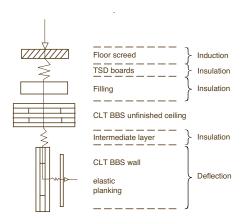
Reduction of structure-borne sound Source: HFA planning brochure "Ceiling structures for multi-storey timber construction", 2009
